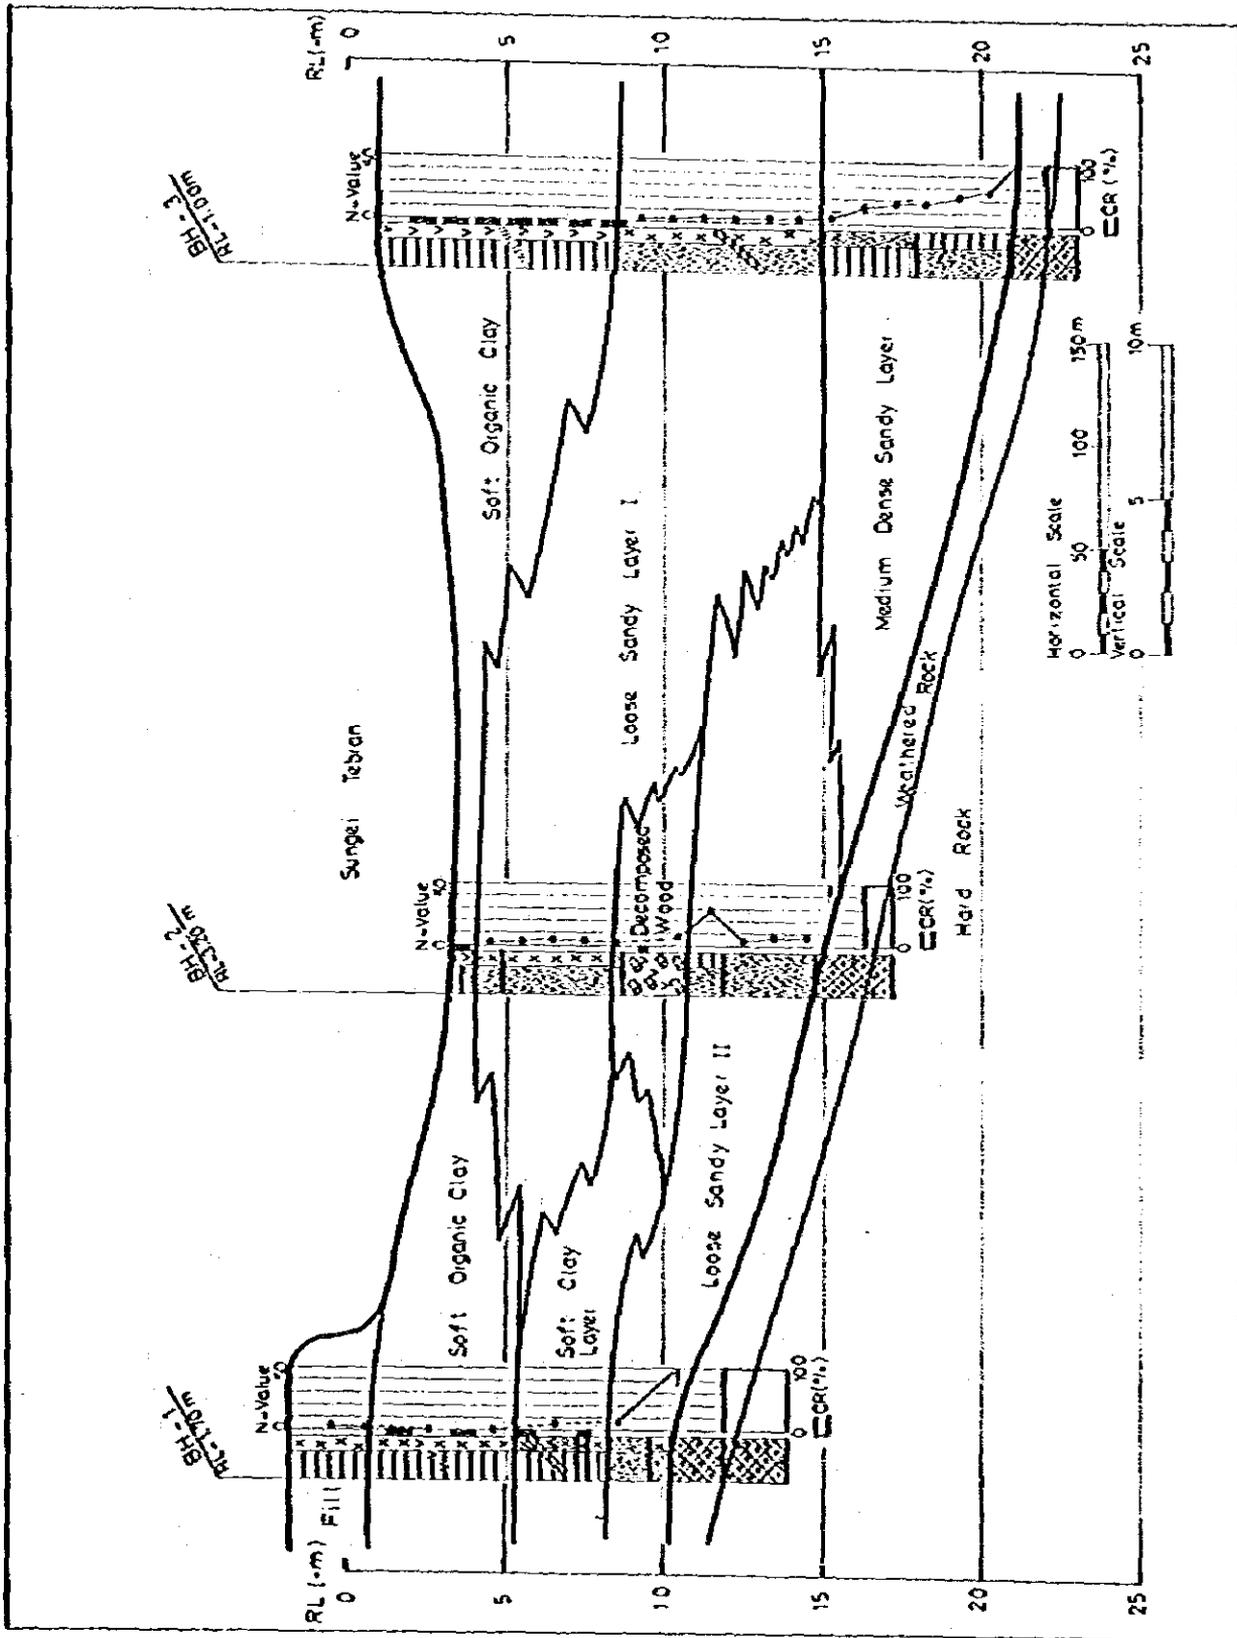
SOIL PROFILE AT THE CROSSING OF SG. TEBRAU, JOHOR BAHRU-PASIR GUDANG SOUTHERN LINK ROAD
